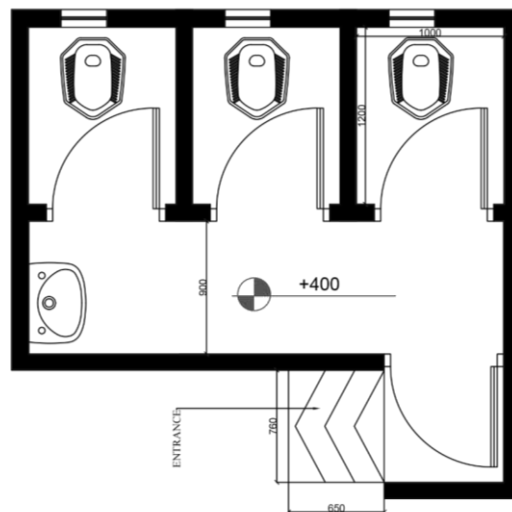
Drafted toilet of SBM Mrutyunjay Temple (Scale 1:30)
